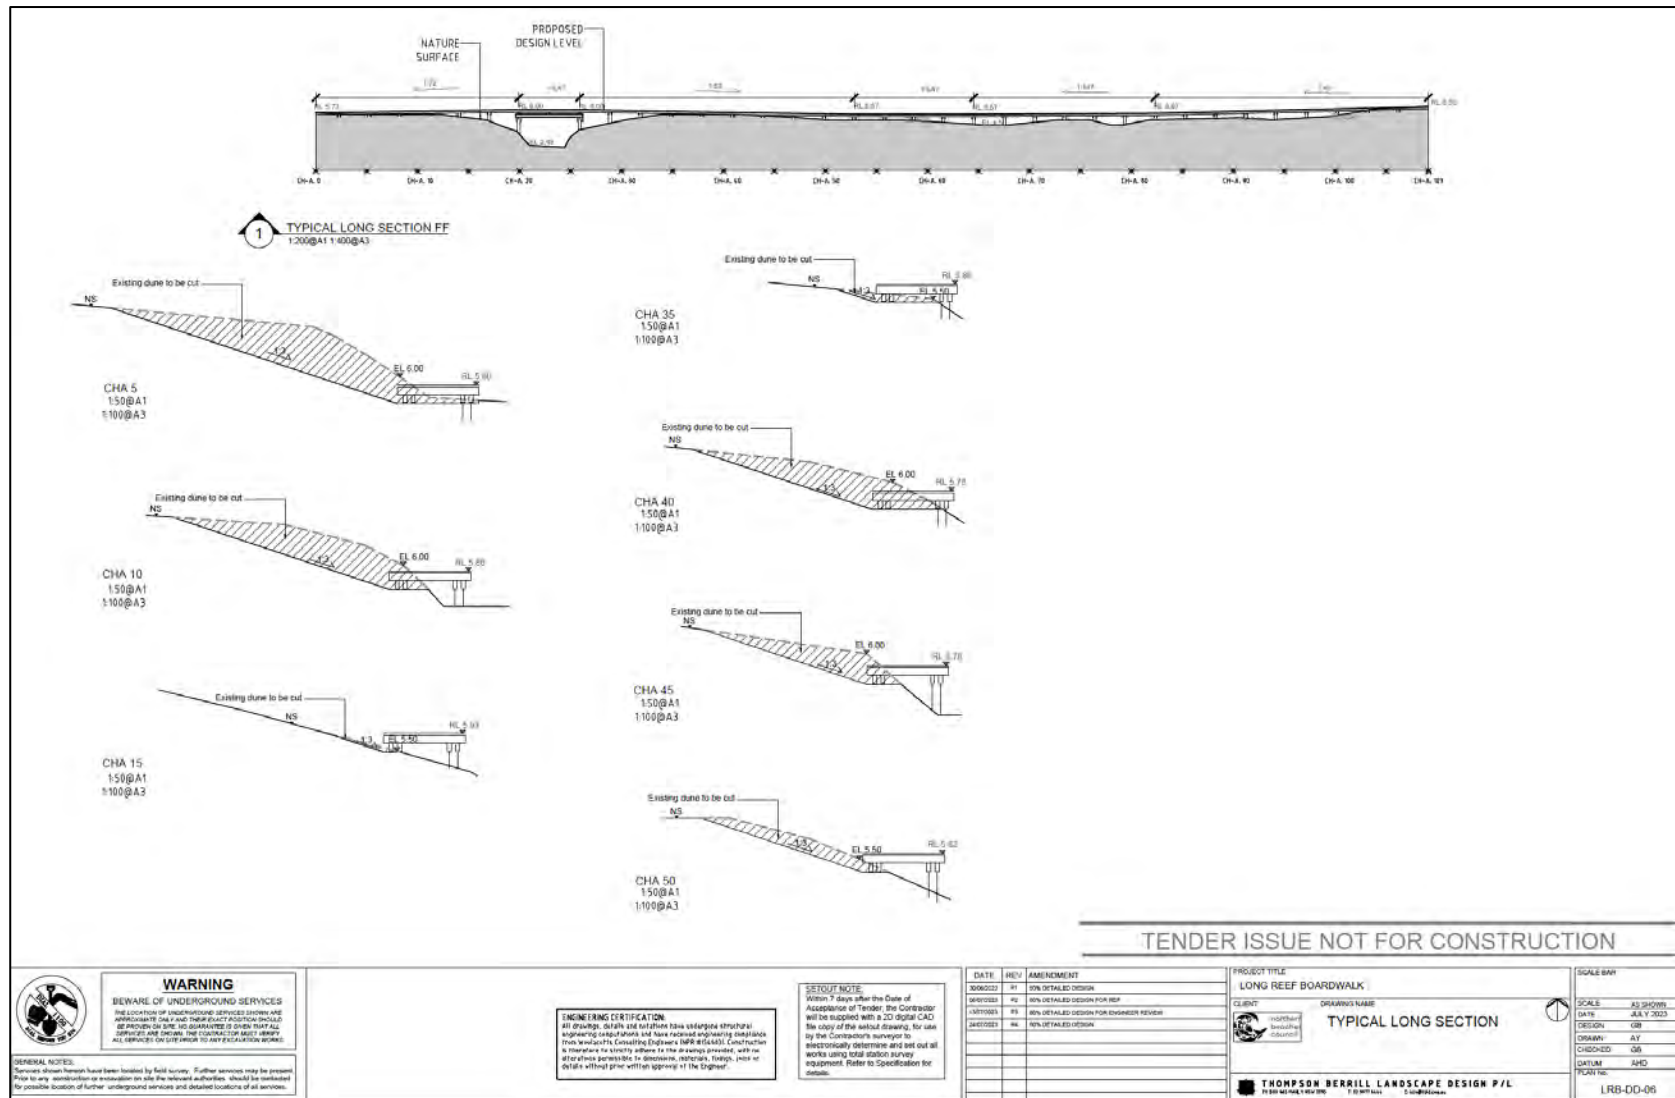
Preliminary draft of proposed cross section of excavation within the sand dune. (Source: Thompson Berrill Landscape Design July 2023 Plan No. LRB-DD-06).
